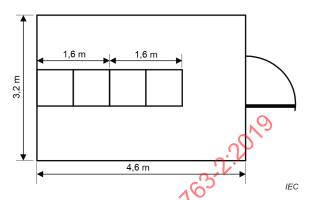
Minimum room dimensions to support distributors containing up to 500 outlets
